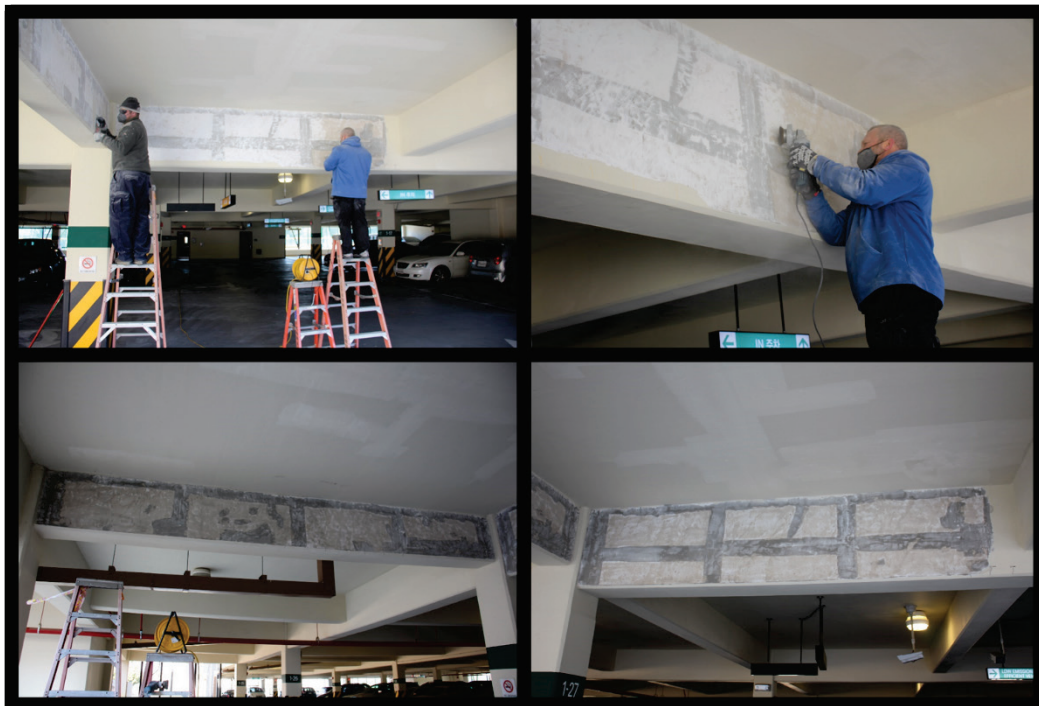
Cracks in bare concrete of beam along column line 4 in Parking Garage 1.
